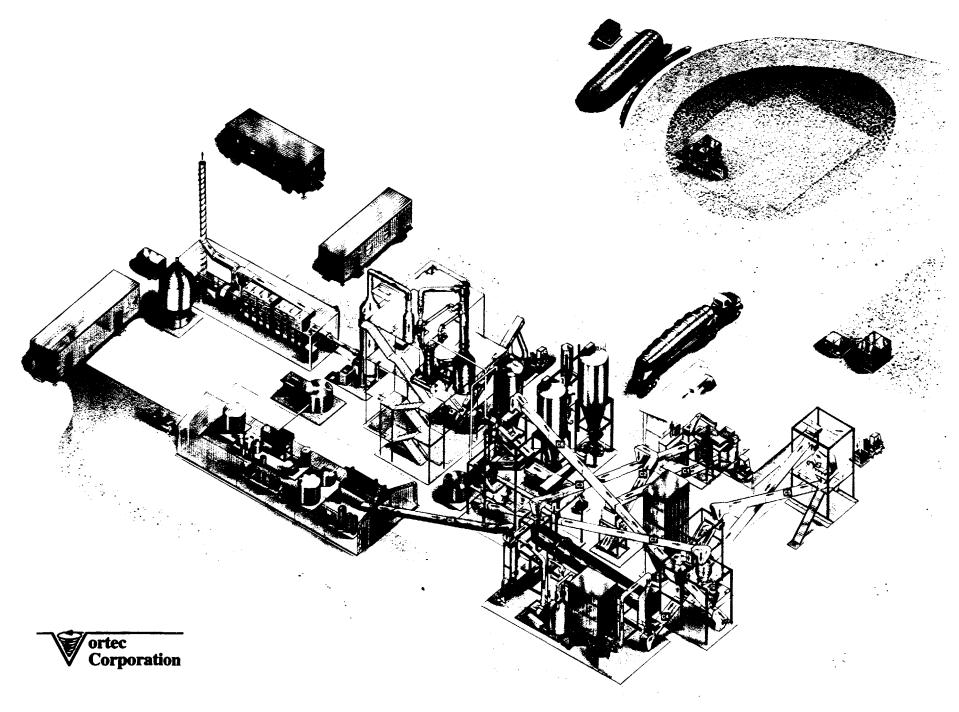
Isometric Drawing of Plant Arrangement
